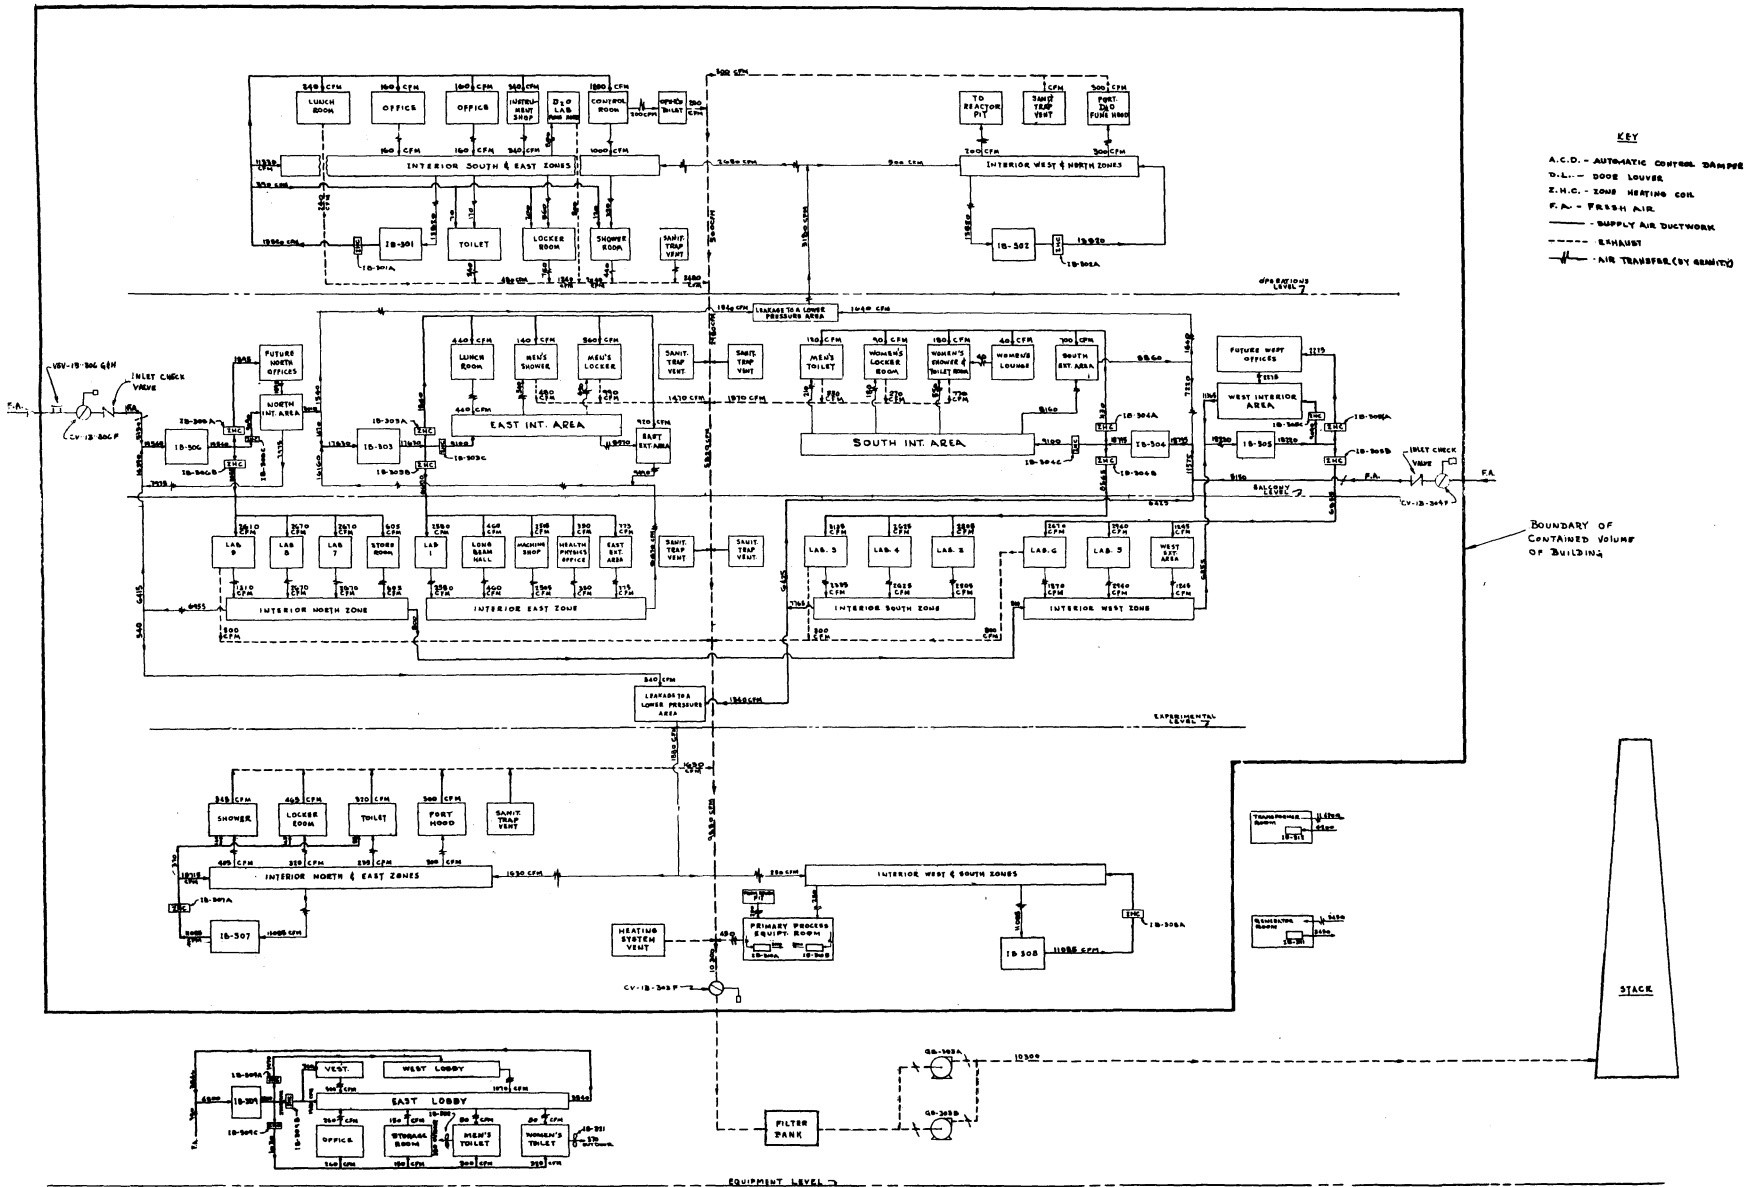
Air conditioning and exhaust flow diagram for the HFBR building.
